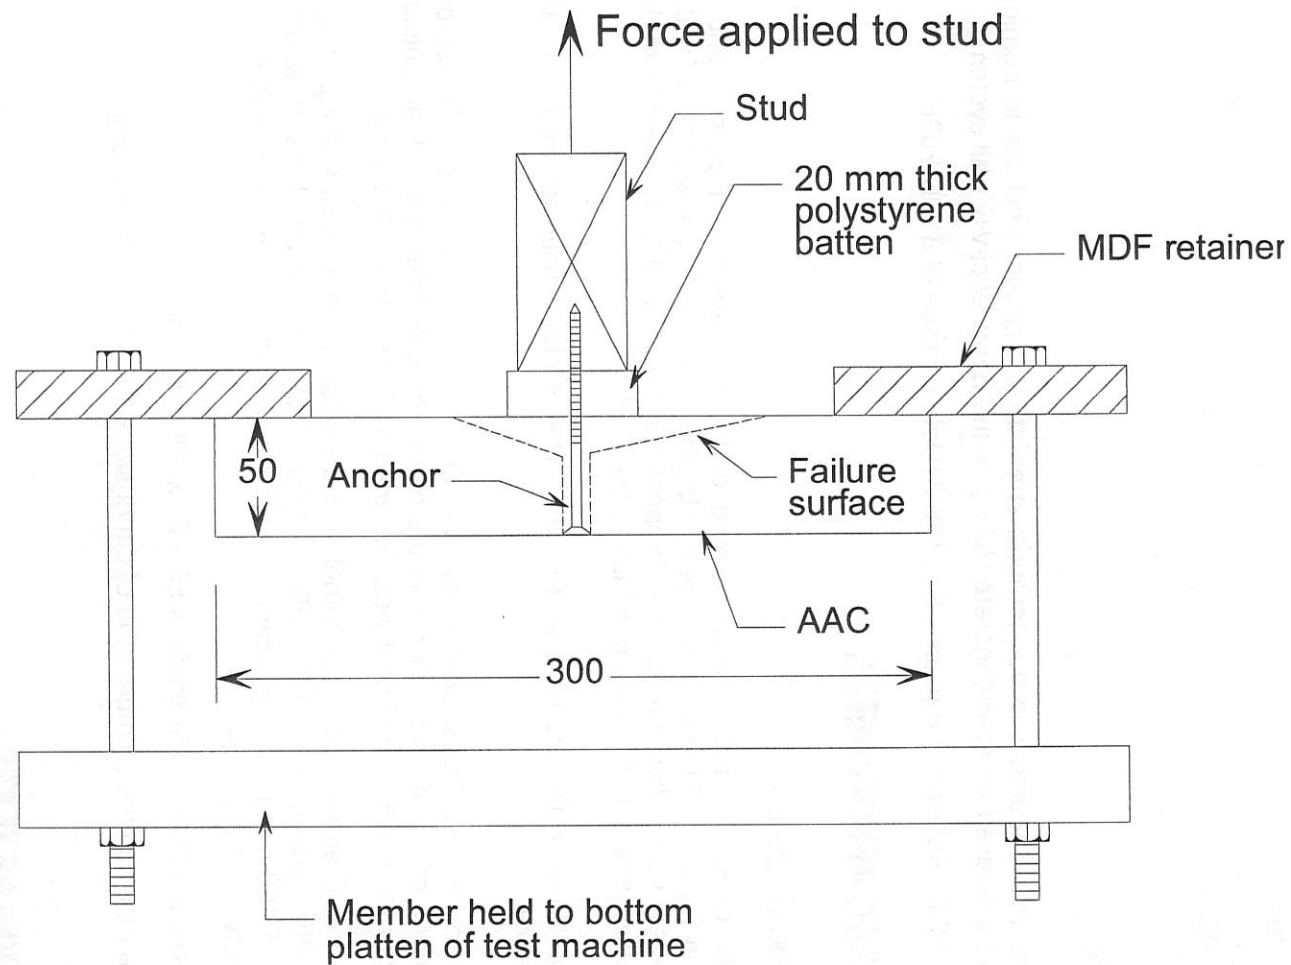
Cross section showing a schematic view of test setup, specimen construction and failure surface in the polystyrene
